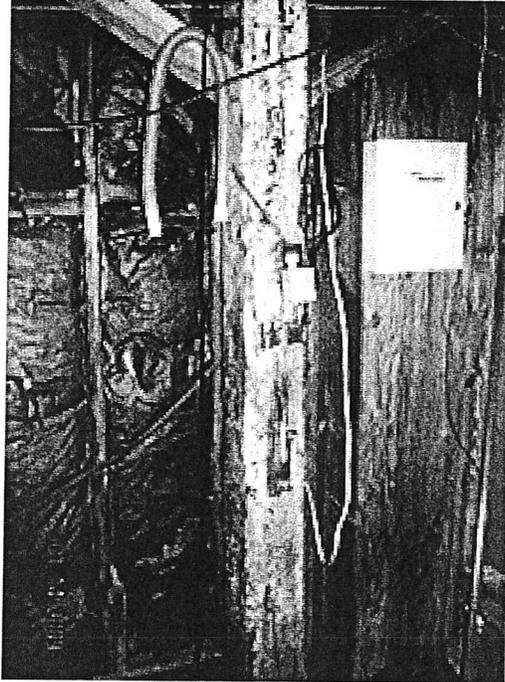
ROOM 24 COLUMNS 2 AND 3
